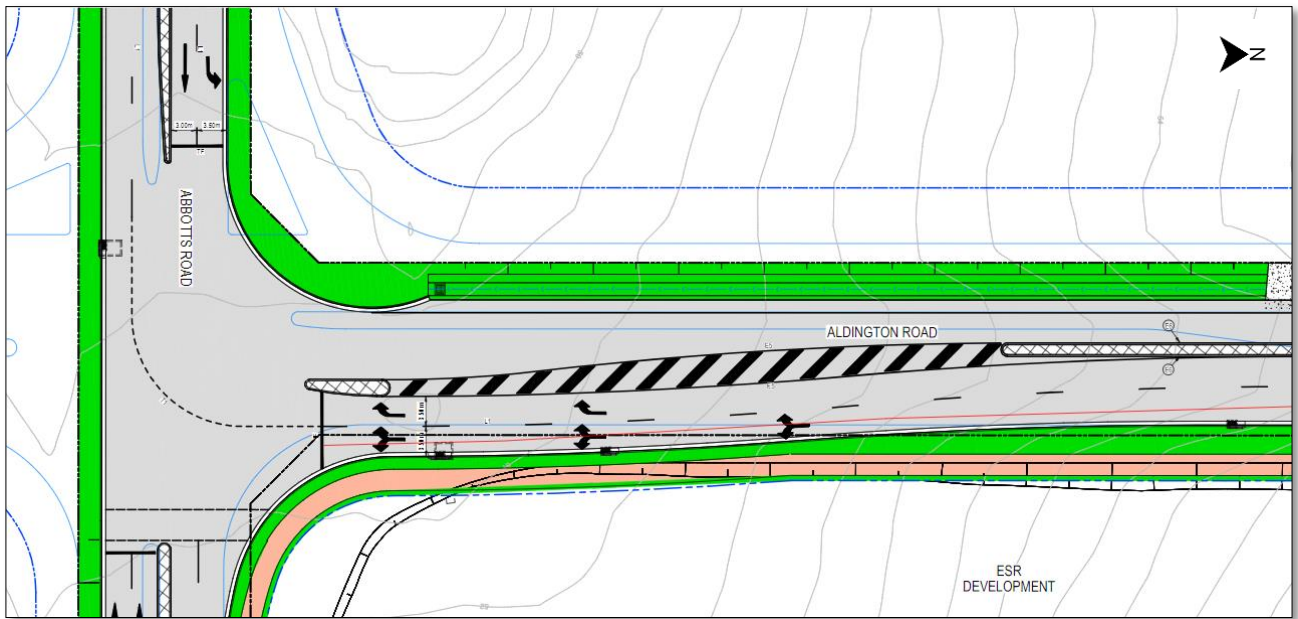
Aldington Road / Abbotts Road (Interim Layout) Source: AT&L Drawing No. 21-843-C554
